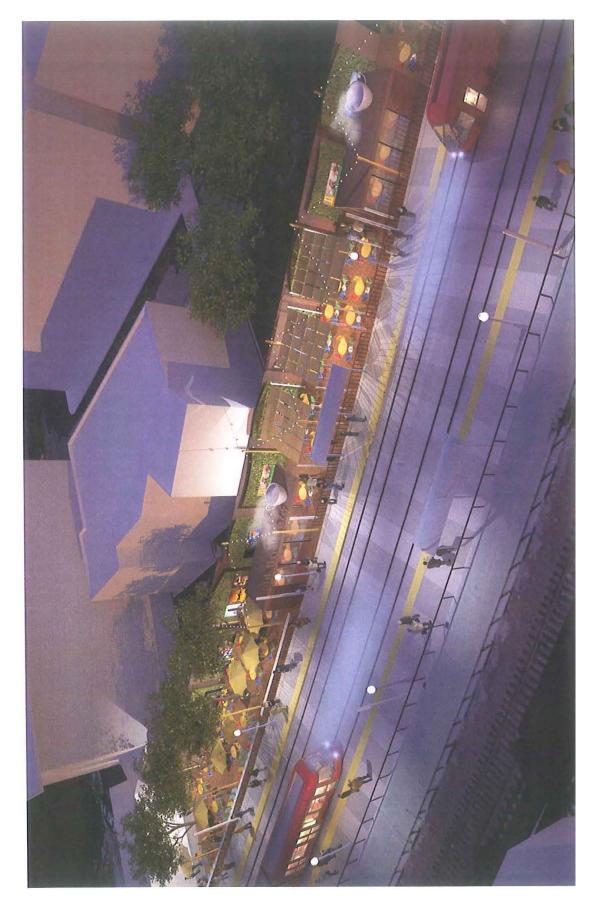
EXHIBIT C CONCEPT DESIGN PLAN (1 of 5 Pages)
